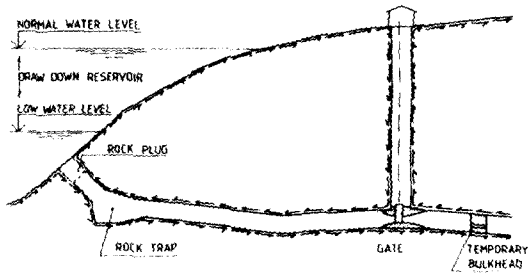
Typical layout for a underwater piercings, from Bjorn Buen (1988).
